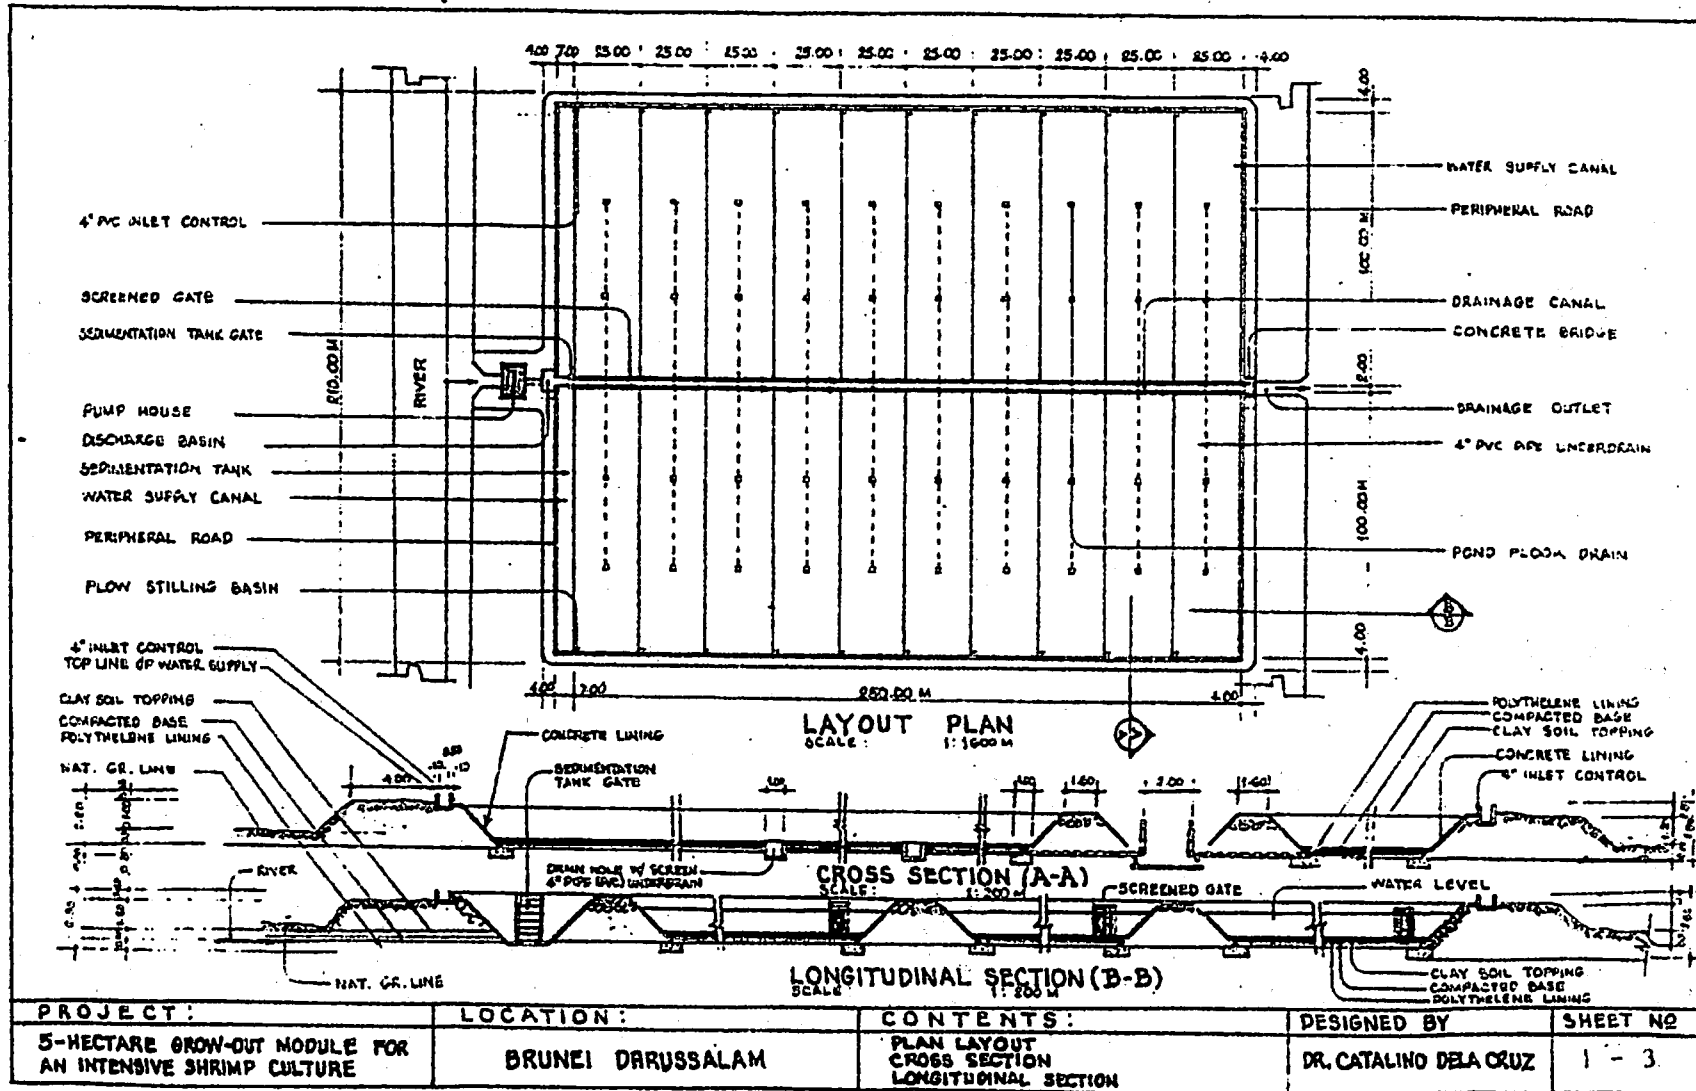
Layout and cross-section of earthen ponds lined with concrete
